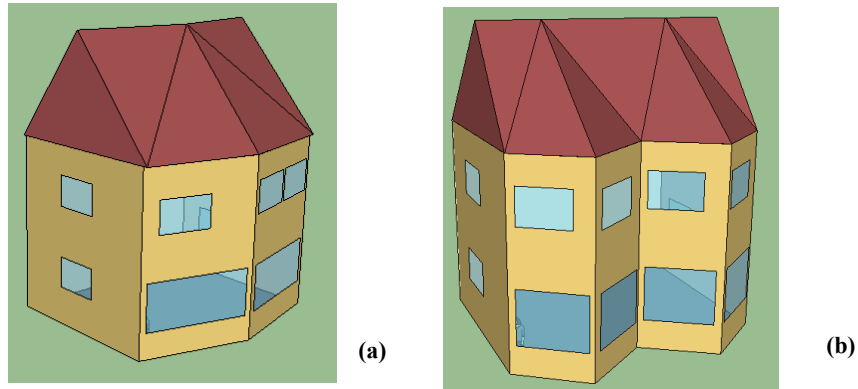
, Folded plates roof option with: (a) rectangular shape, (b) redesigned south facing façade.
